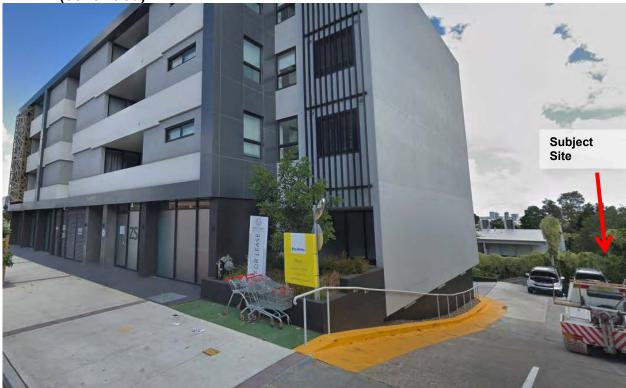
Photograph of mixed use development to the east at No. 734 Victoria Road
